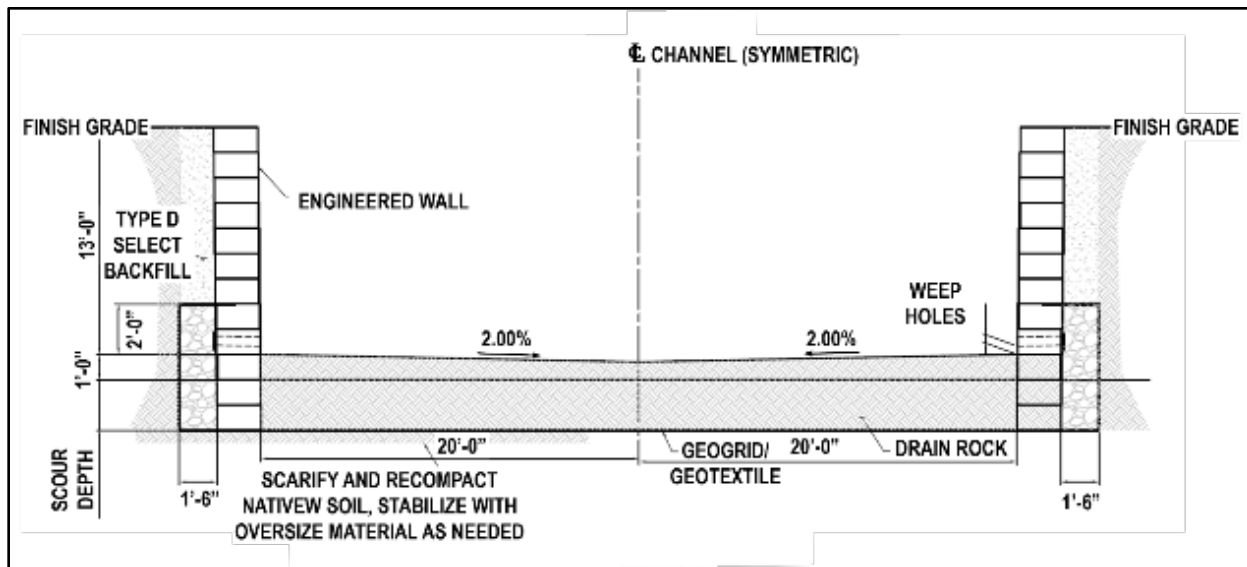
Flood Wall Cross Section (8,820 cfs)
